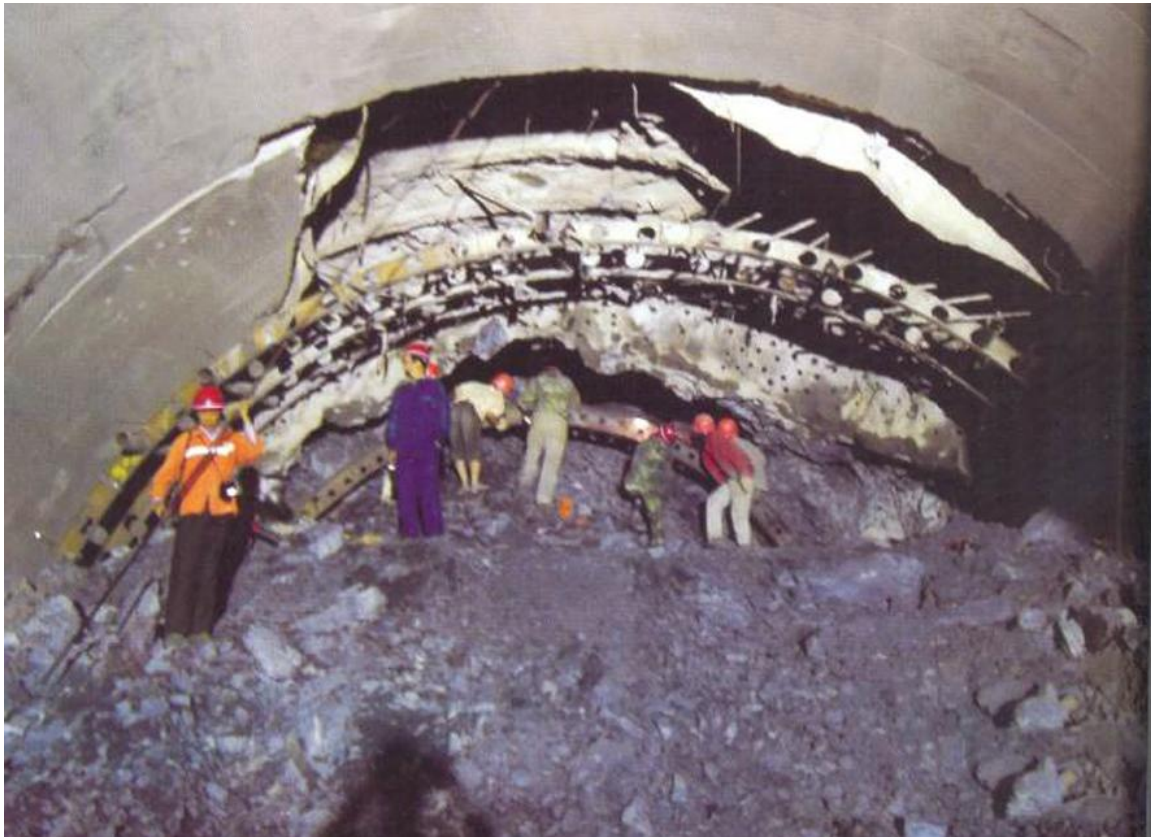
Collapse of the tunnel at the crossing of the fault.
